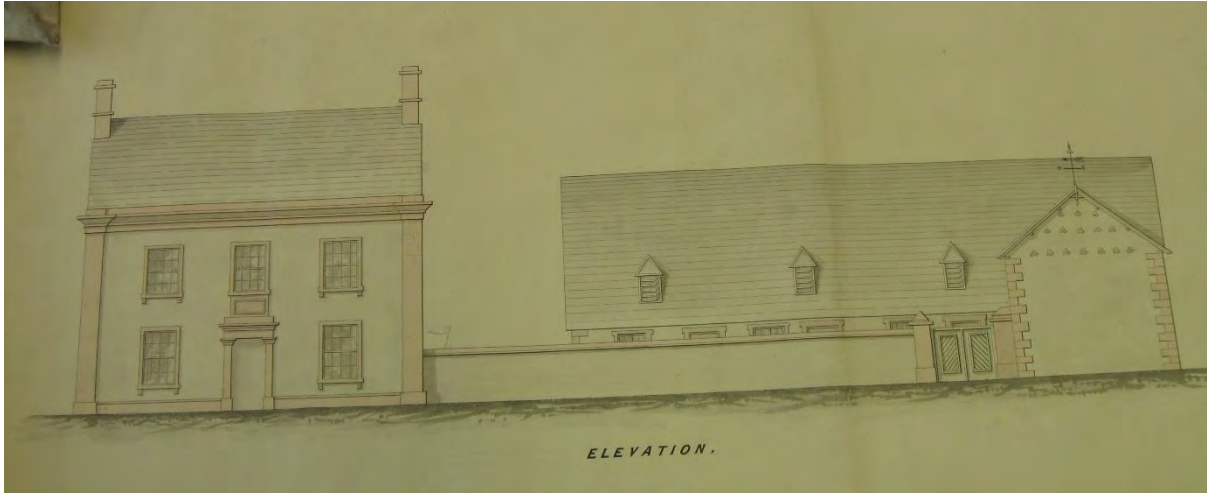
Elevation plan of farmhouse and farmstead as it appears from the road. The plan is signed by John Slee, 28th December 1859 (this is the day before he signed the contract for Low Row).¹²³
